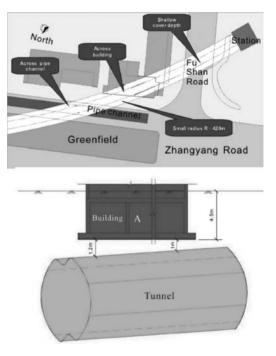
Dot shield tunnel run across the buildings (by *He et al.*).
